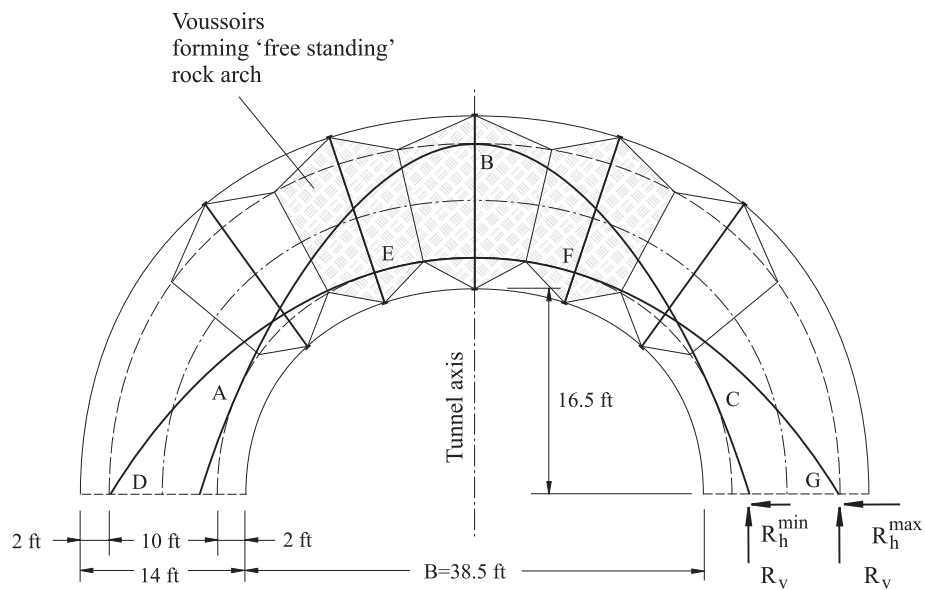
‘Voussoir’ arch formed by reinforced rock units (after Lang, 1961).
